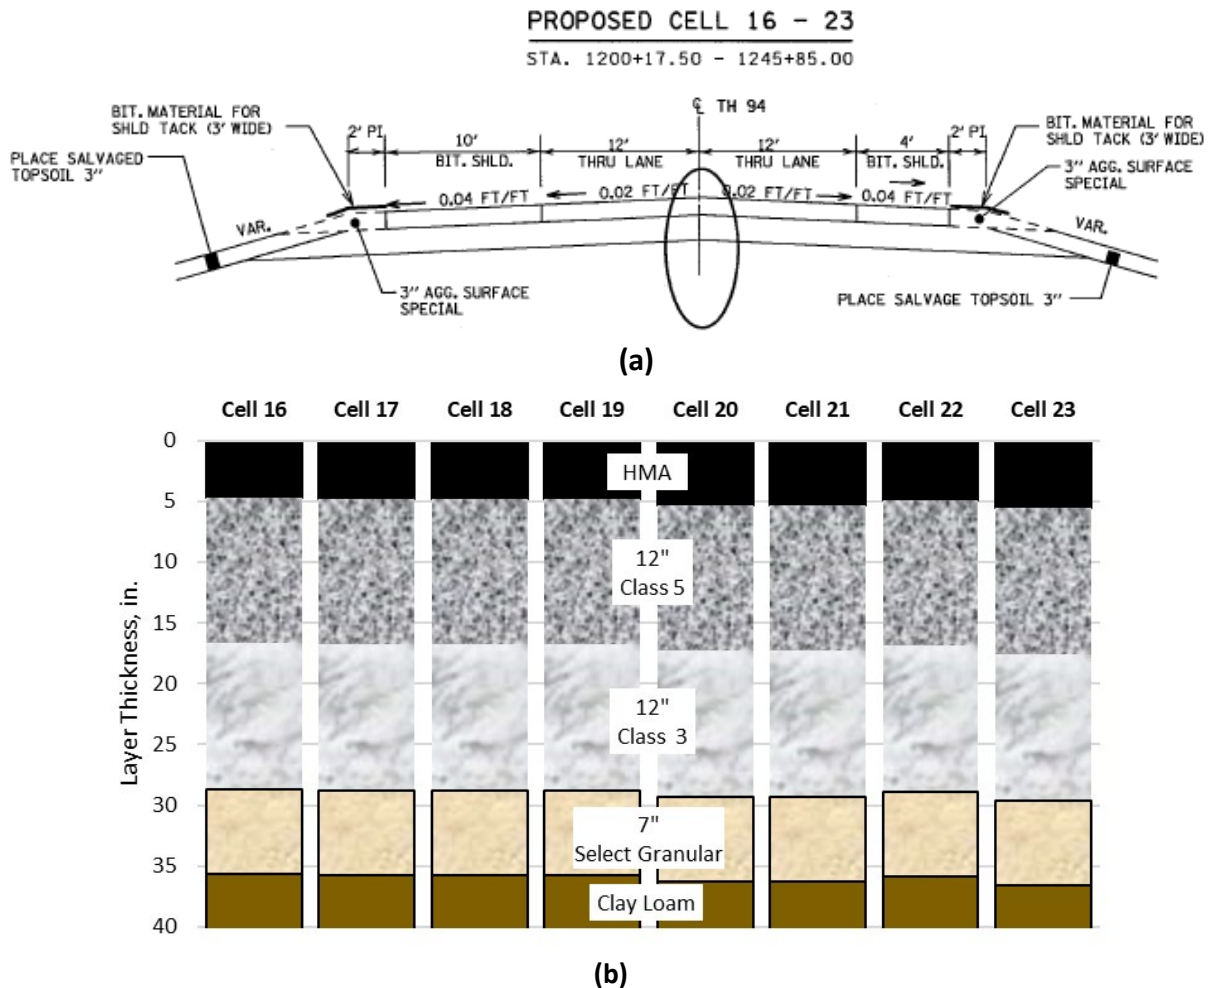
(a) Cross-section of Cracking Group Test Sections MnROAD (b) As-Built Pavement
